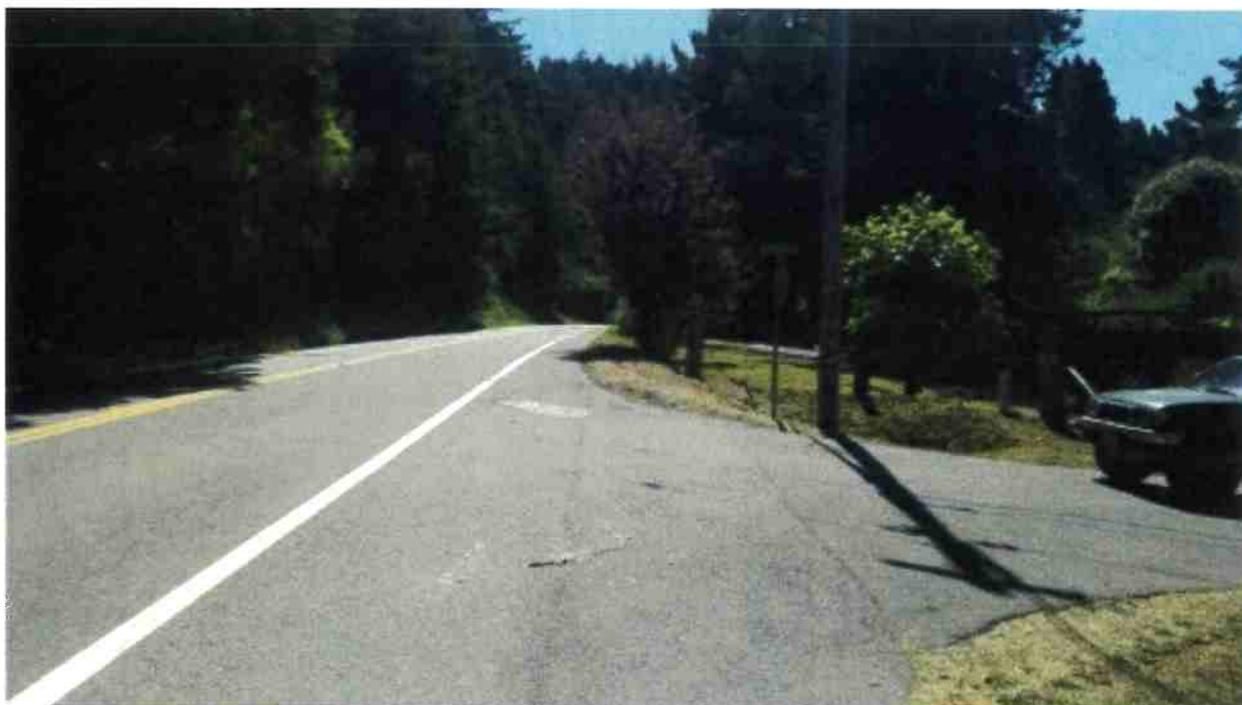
Paved apron of interface between Freshwater Road and Steele Lane looking SE.
